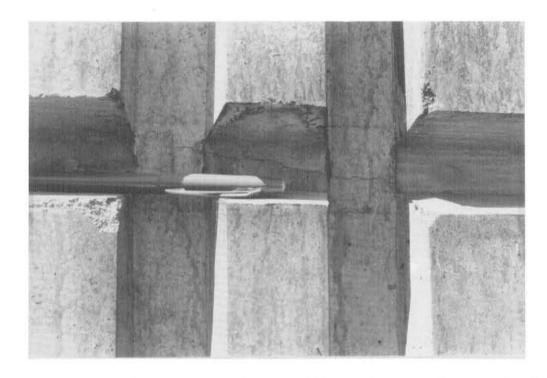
Typical Cracks Along the Horizontal Rustication of the Concrete Panels.
